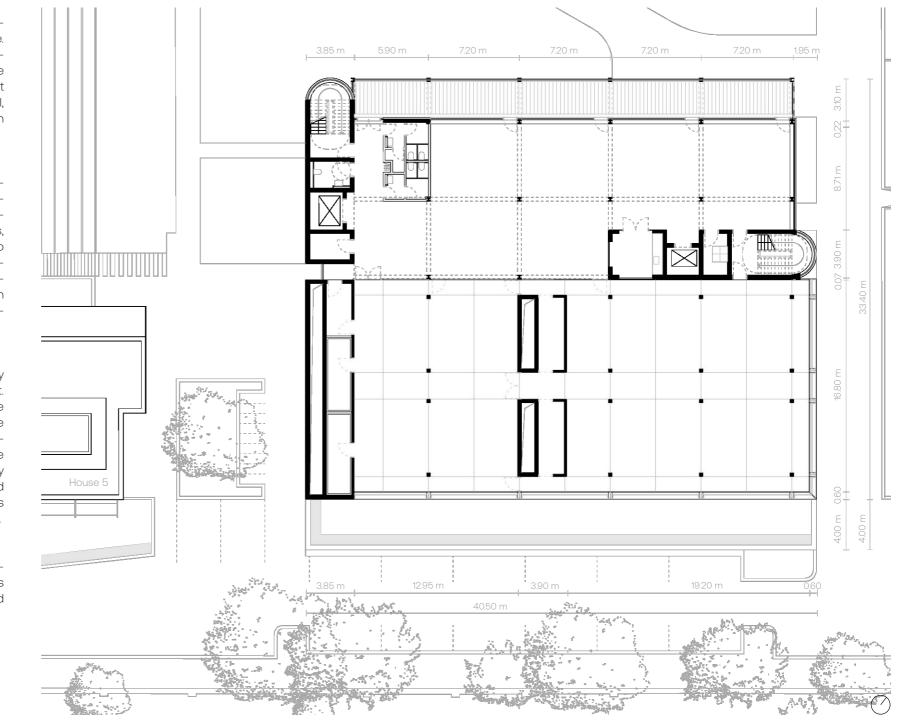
| Standard Floor | Floor plan | Scale 1:300
